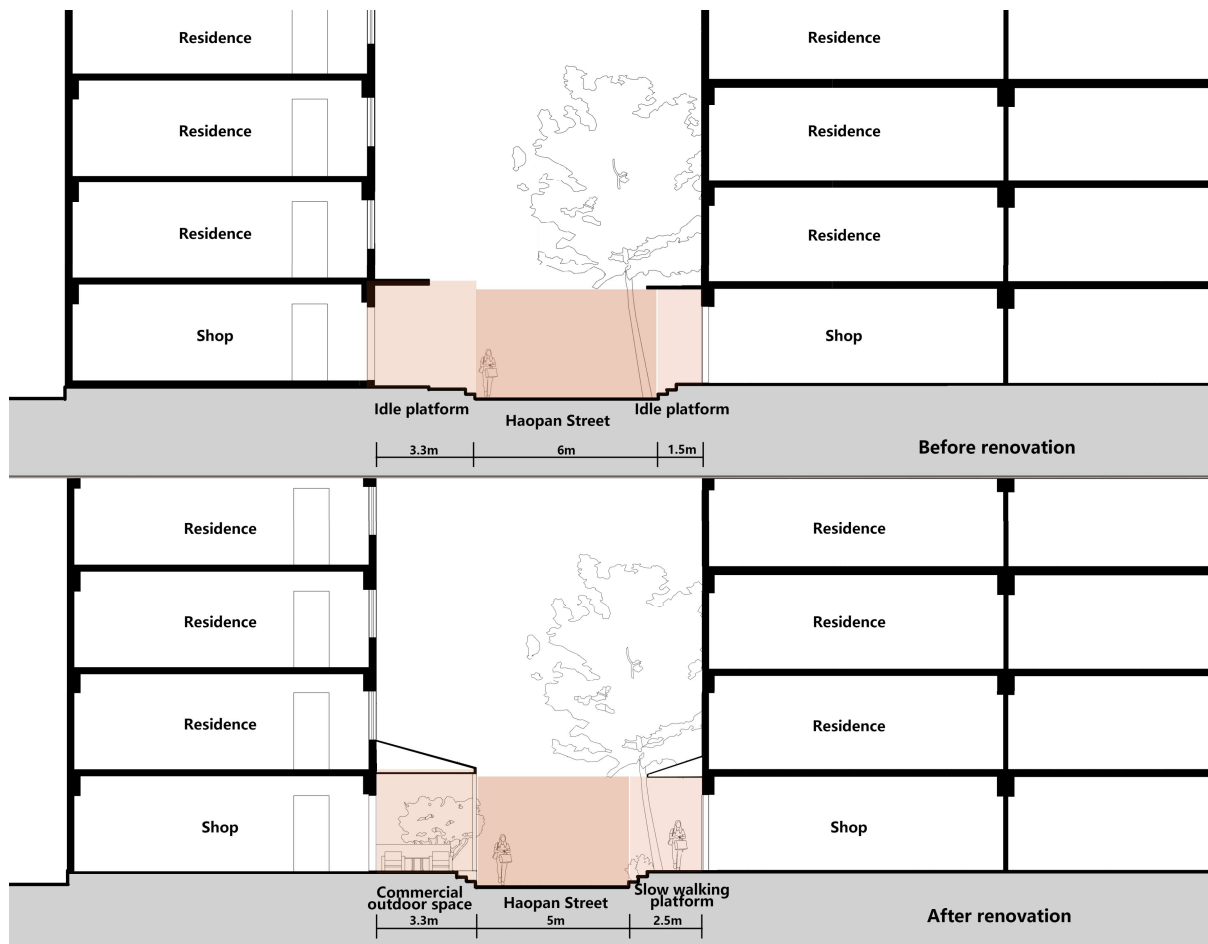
Street Node 1 Pre - and Post Renovation Sectional View
